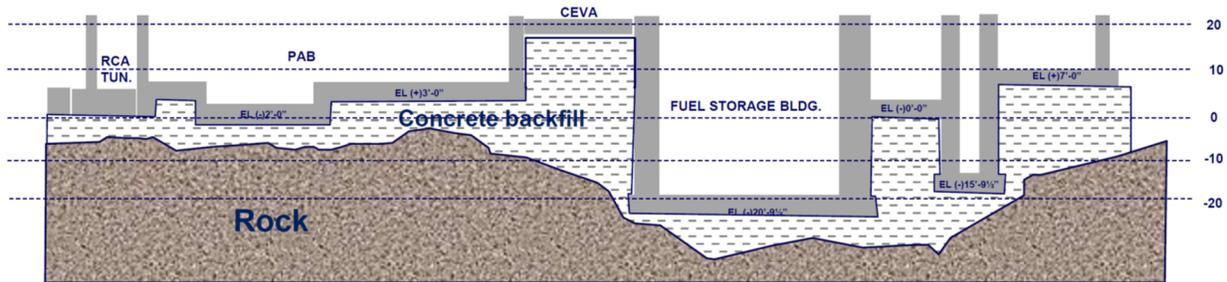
Illustration of bedrock, concrete backfill, and plant structures.
